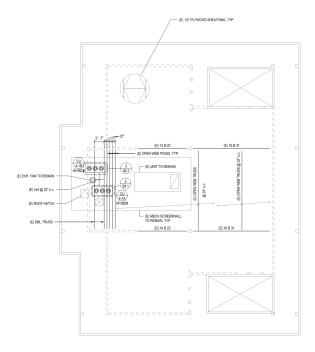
BUILDING 4: 2017 HVAC Upgrade Roof Framing Plan
